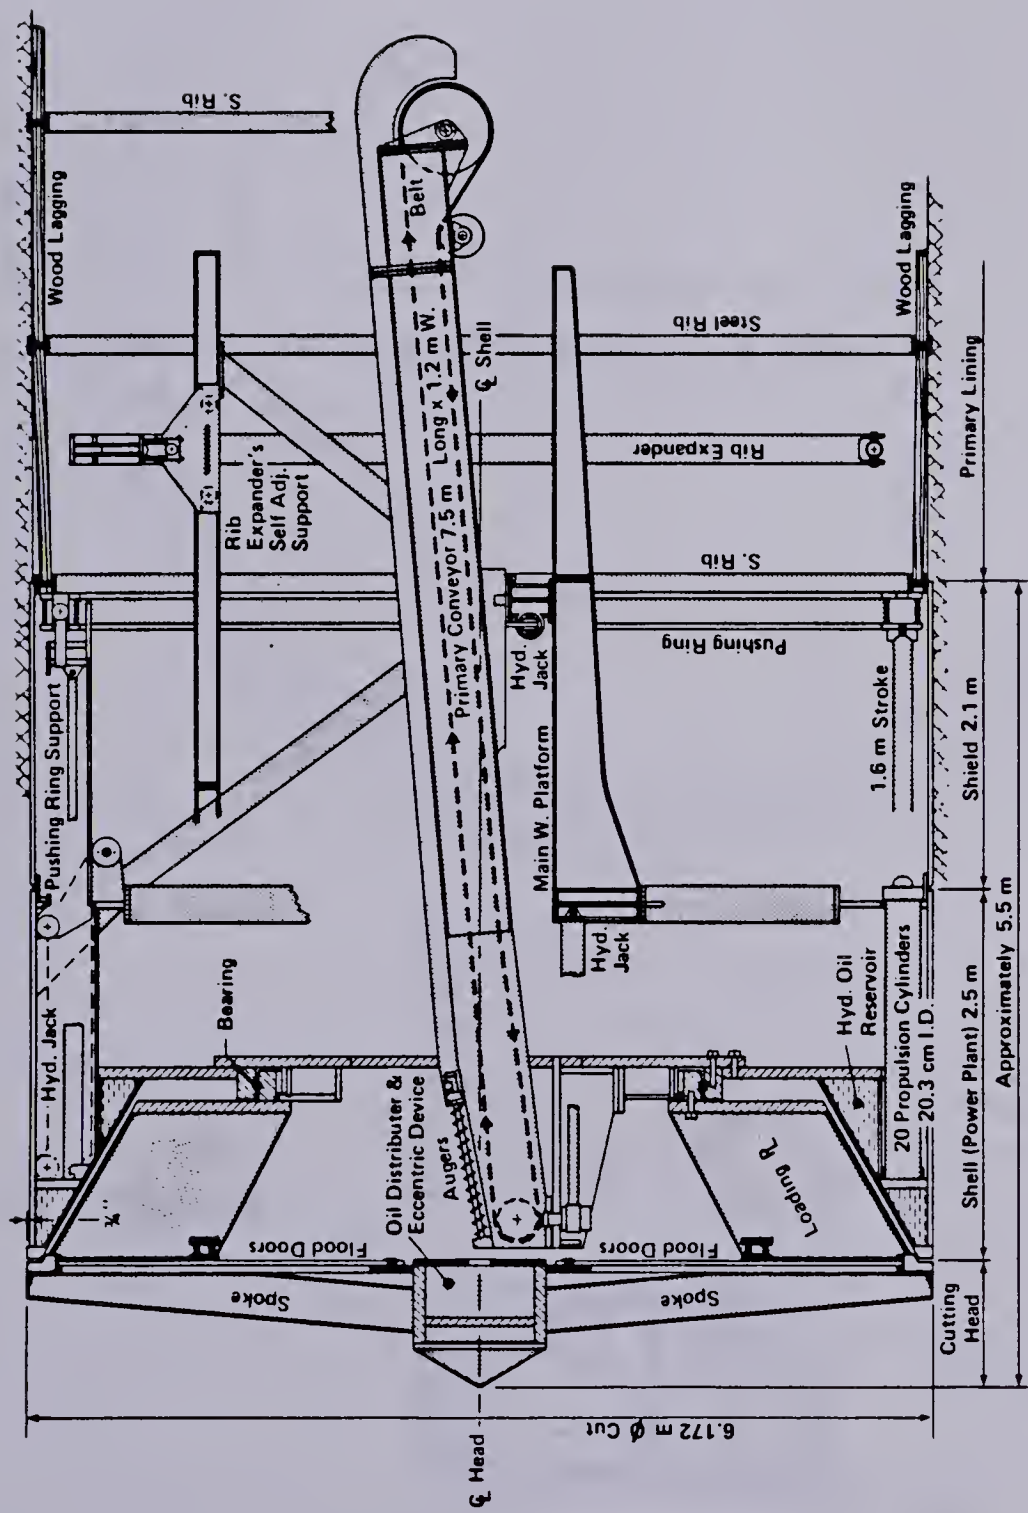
SECTION THROUGH THE SHIELDED MOLE (AFTER LOVAT TUNNELING EQUIPMENT INC.)
